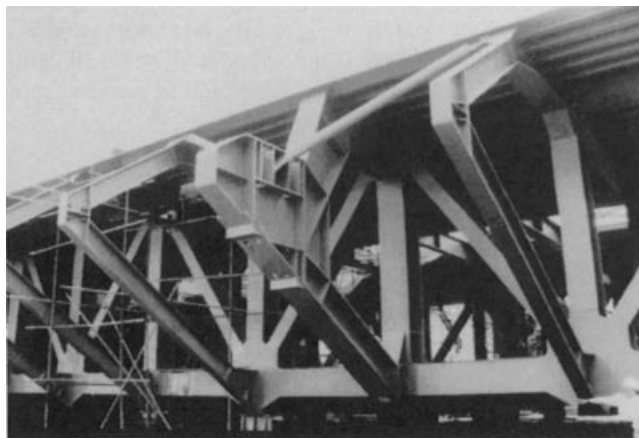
Cross section of the deck structure in the Tsing Ma Bridge
